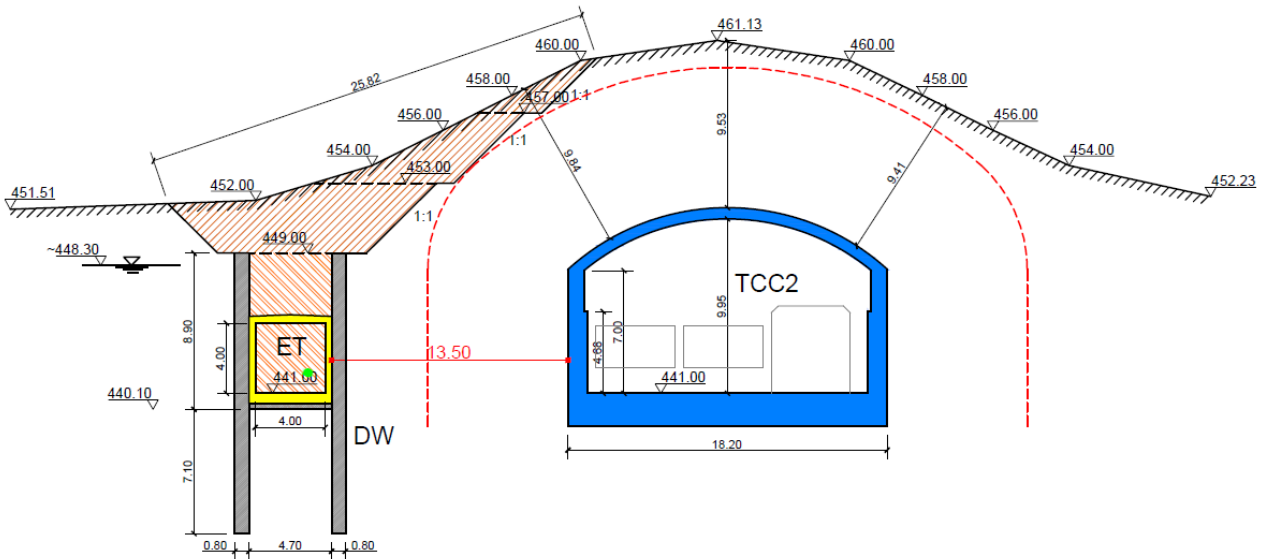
Cross section 6.1. Diaphragm walls are 16m depth.
